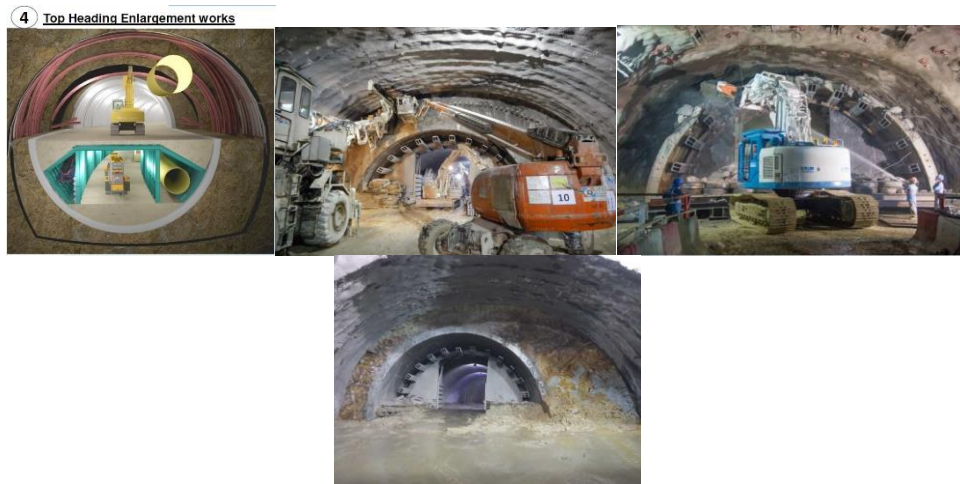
Pilot TBM tunnel top heading enlargement works from the top of the temporary steel gallery
